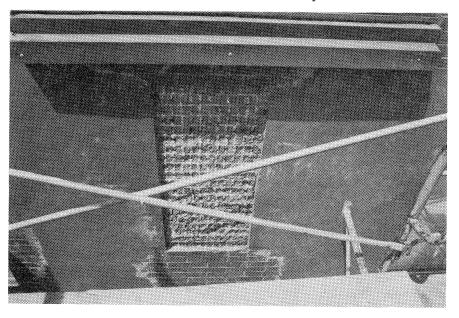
Brick Panel to be Replaced with New Brick "Column"
